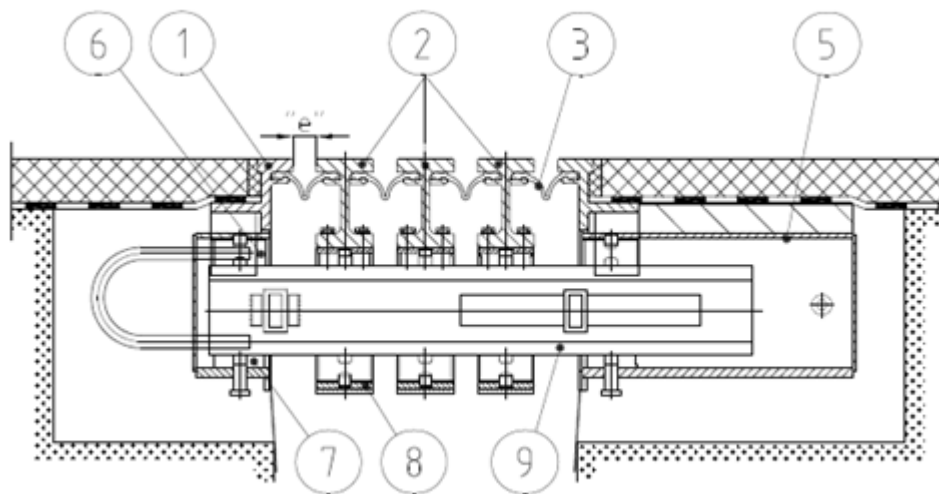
Cross section at carriageway with crossbeam of single crossbeam modular expansion joint with shear control elements under centre beams
